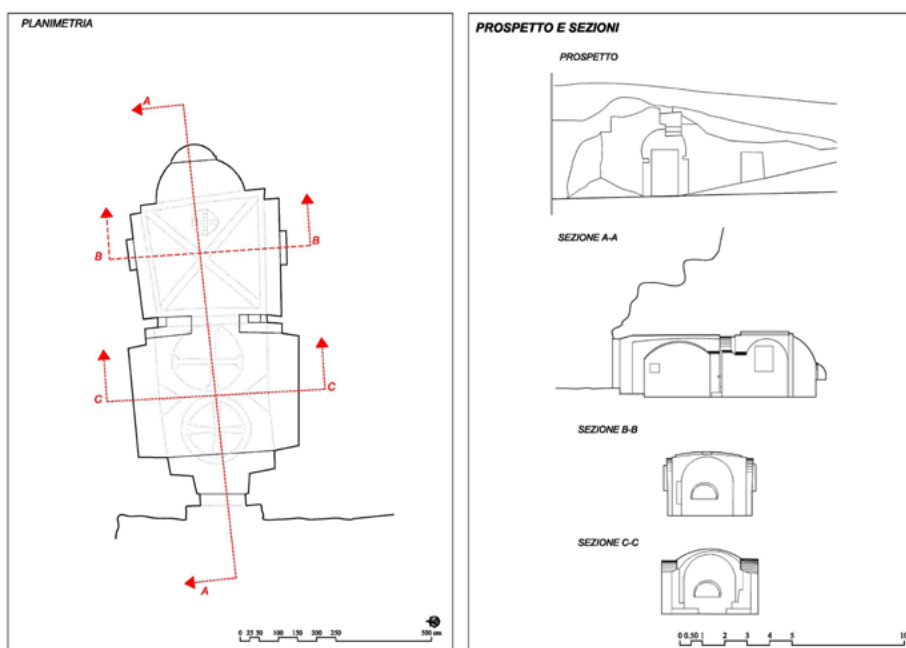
Matera, Madonna delle Croci (or della Croce), plan, elevation and sections (provided by Maurizio Lazzari)
